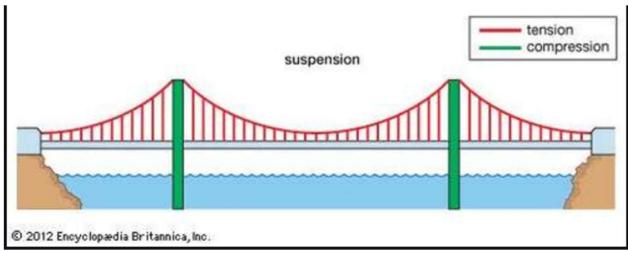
Compression and Tension Force in Suspension Bridge [60]
